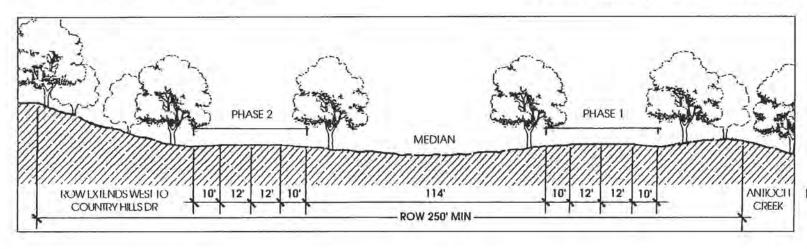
Typical section, Route 4 Bypass (looking north).
